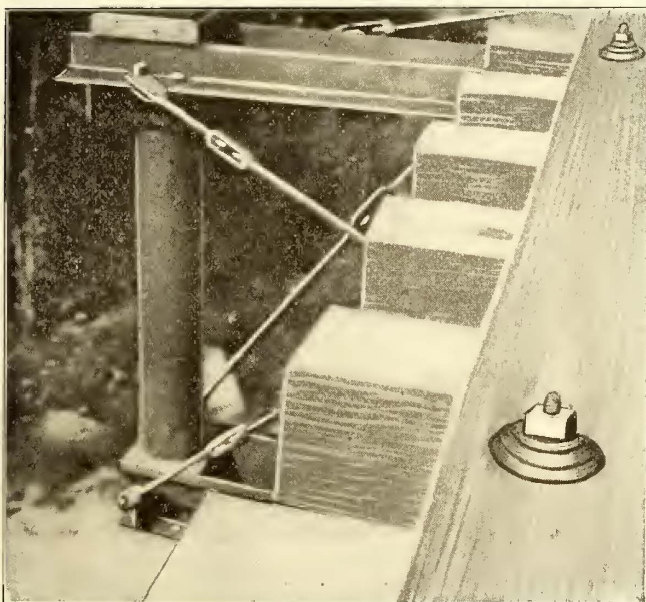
Boyertown & Pottstown Railway—Trolley Pole on Viaduct Set in Concrete in the Lower Box Beam
